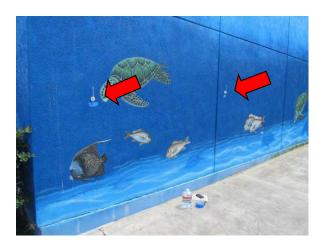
Rilem test tubes affixed to wall in preparation for testing.
